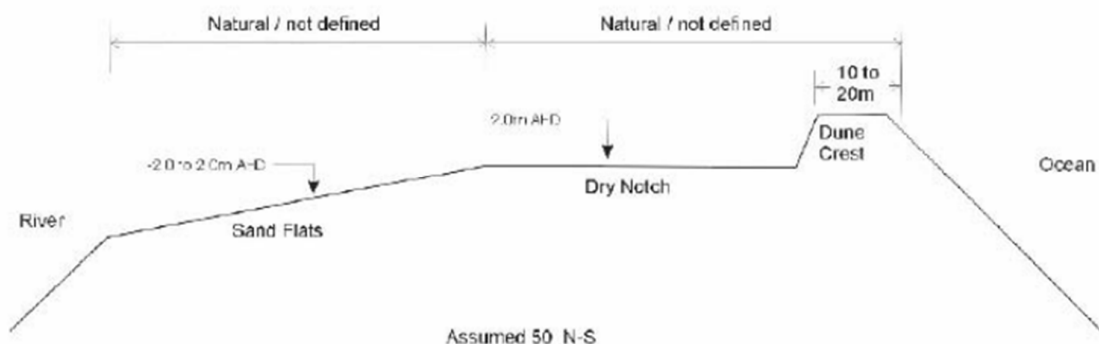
Typical Section of Entrance (Shoalhaven River Entrance Management Plan for Flood Mitigation (2006))
